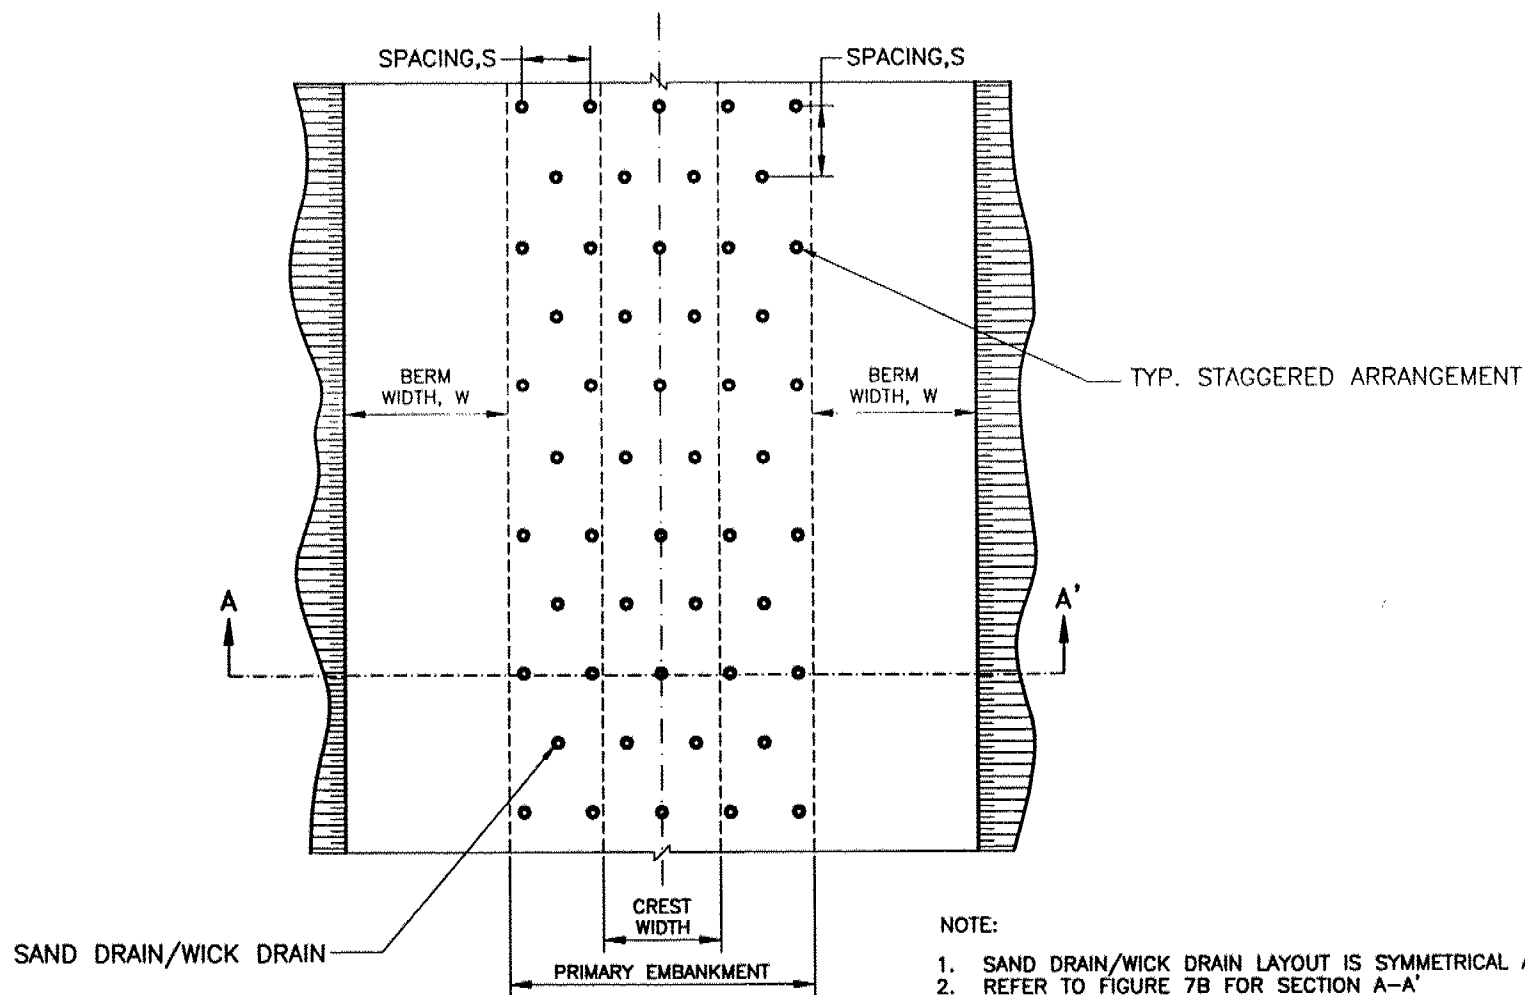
GENERALIZED ROAD EMBANKMENT GEOMETRY— HIGHWAY 69, 0.4km SOUTH OF MUSQUASH RIVER, NORTHERLY 8.9 km TO TOWER ROAD.
